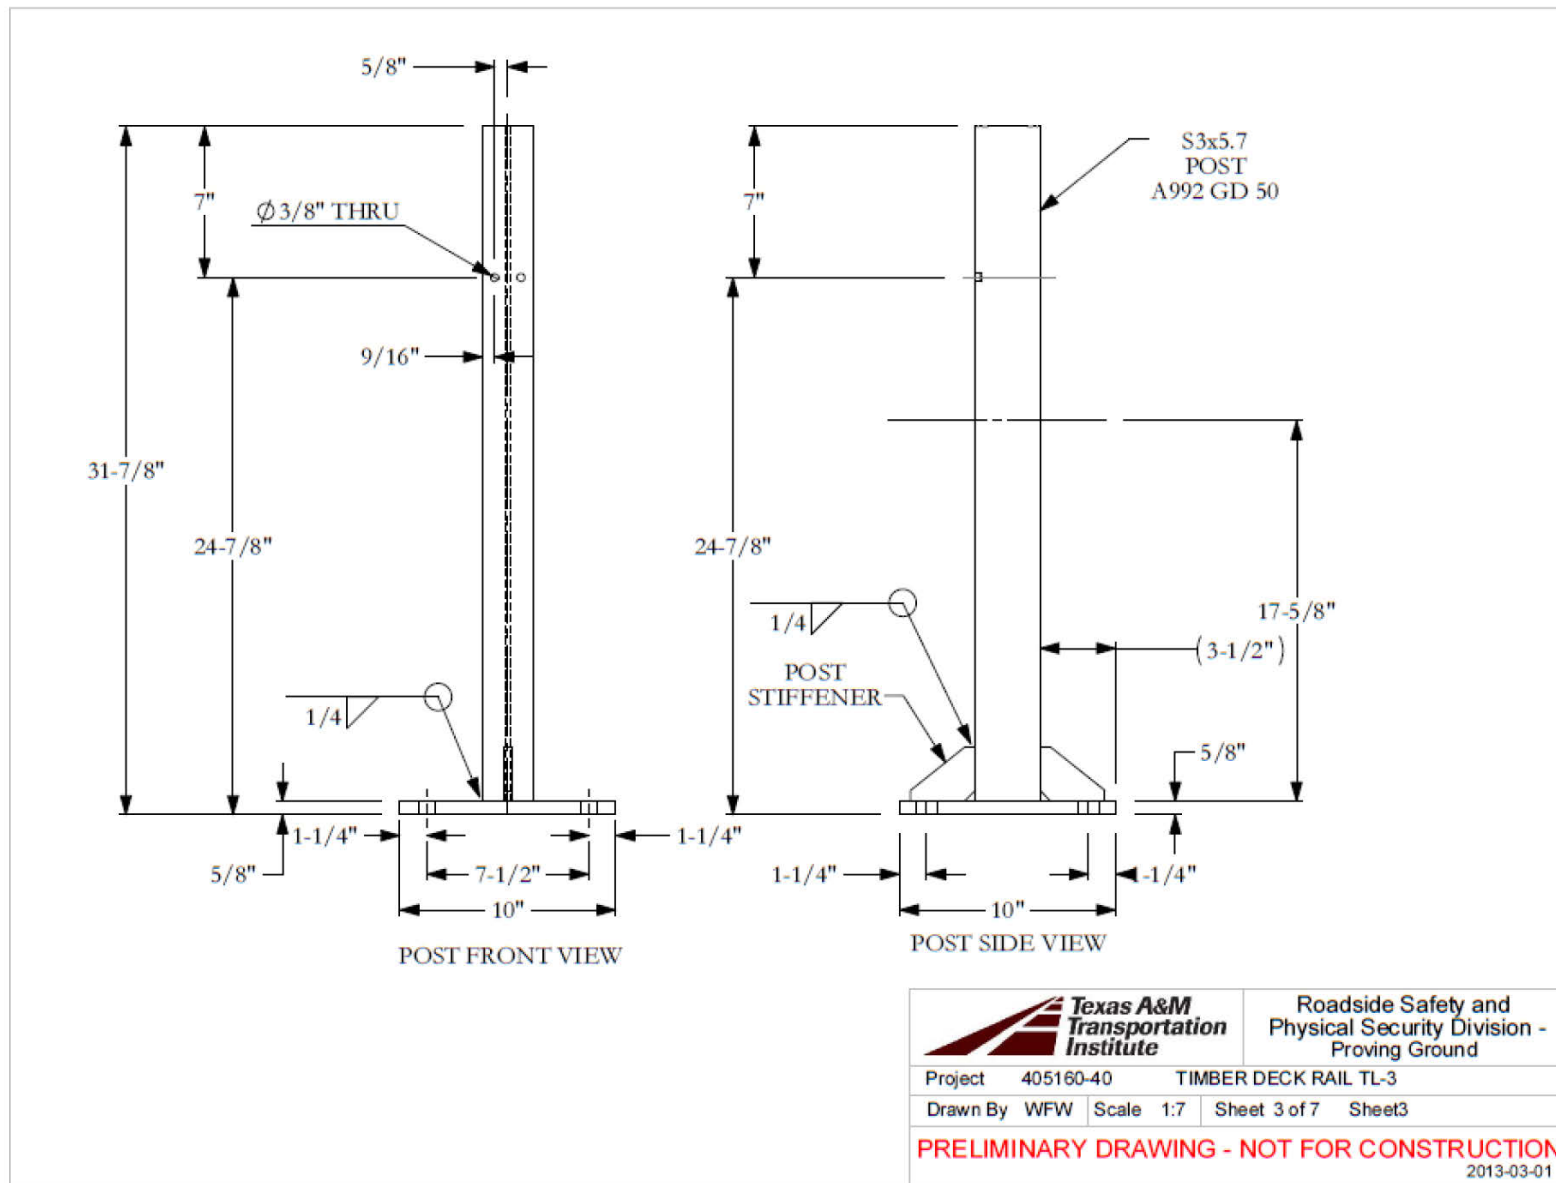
Cont'd - Details of W-Beam Bridge Rail for Temporary Timber Deck Bridge
